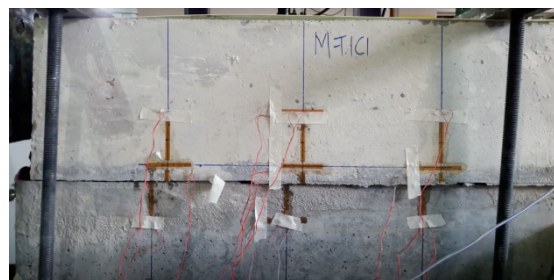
Condition of the proposed design model wall-to-wall connection type 1, Dapped Wet (MT1C1) at failure
